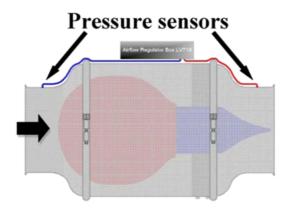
Drawing of LeanVent damper and placement of pressure sensors.
